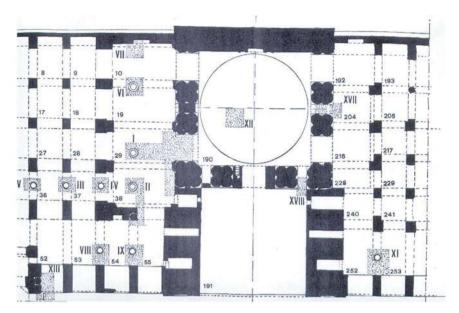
plan of the trenches excavated by Eugenio Galdieri in 1970 (detail, from Galdieri 1972).
